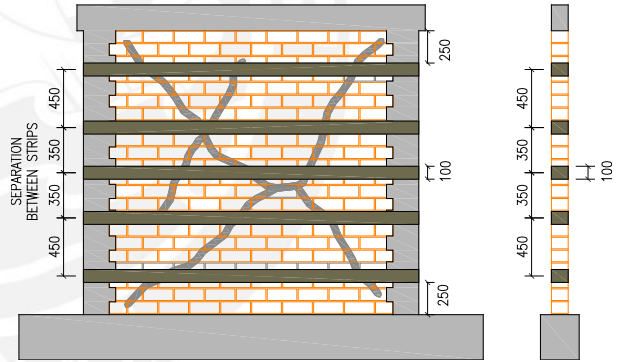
Details of the reinforcement for the repaired walls (dimensions in millimeters)
